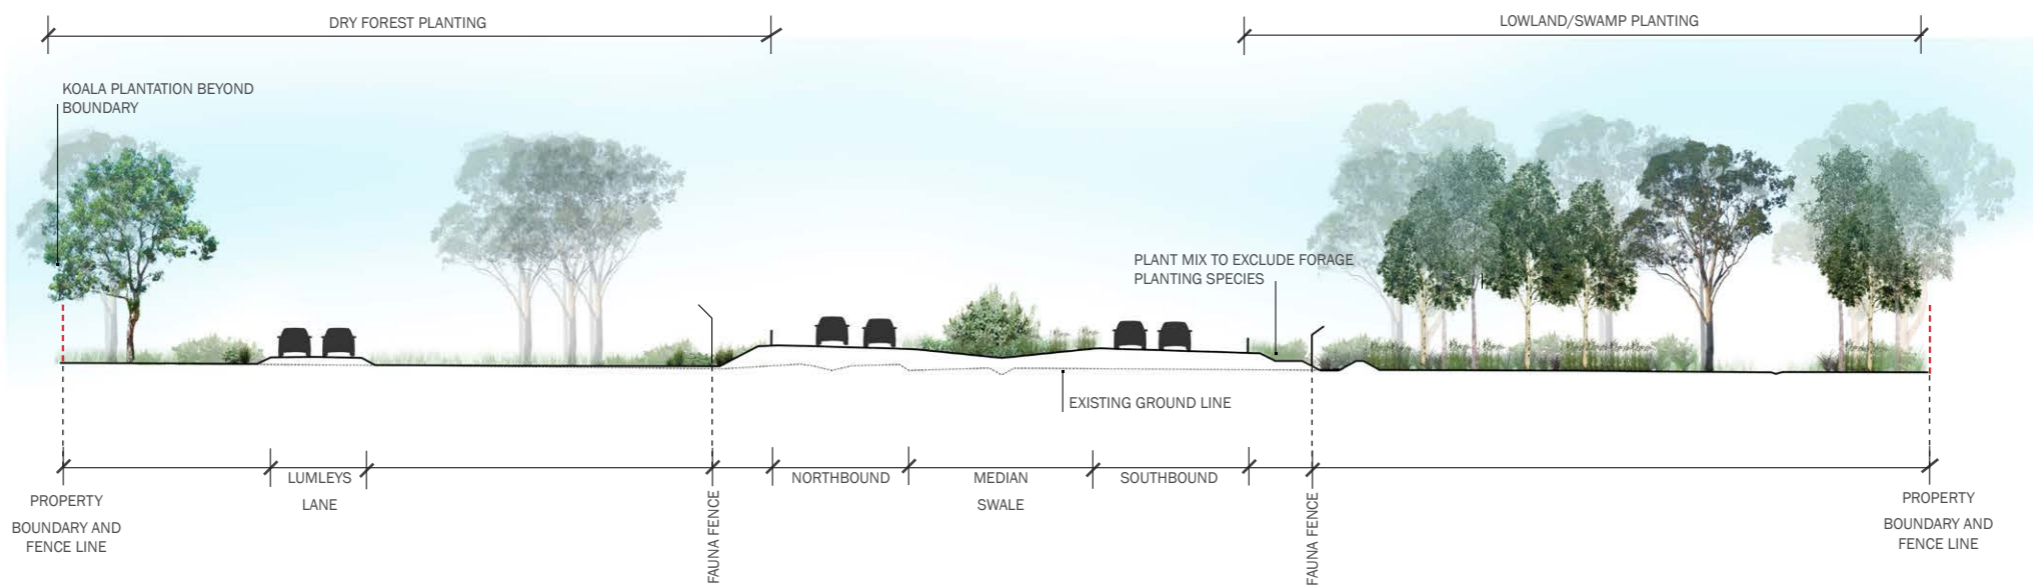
Cross section E-E in Wardell (Scale 1:400) Note: Fence locations and types are to be confirmed, and subject to further design development
